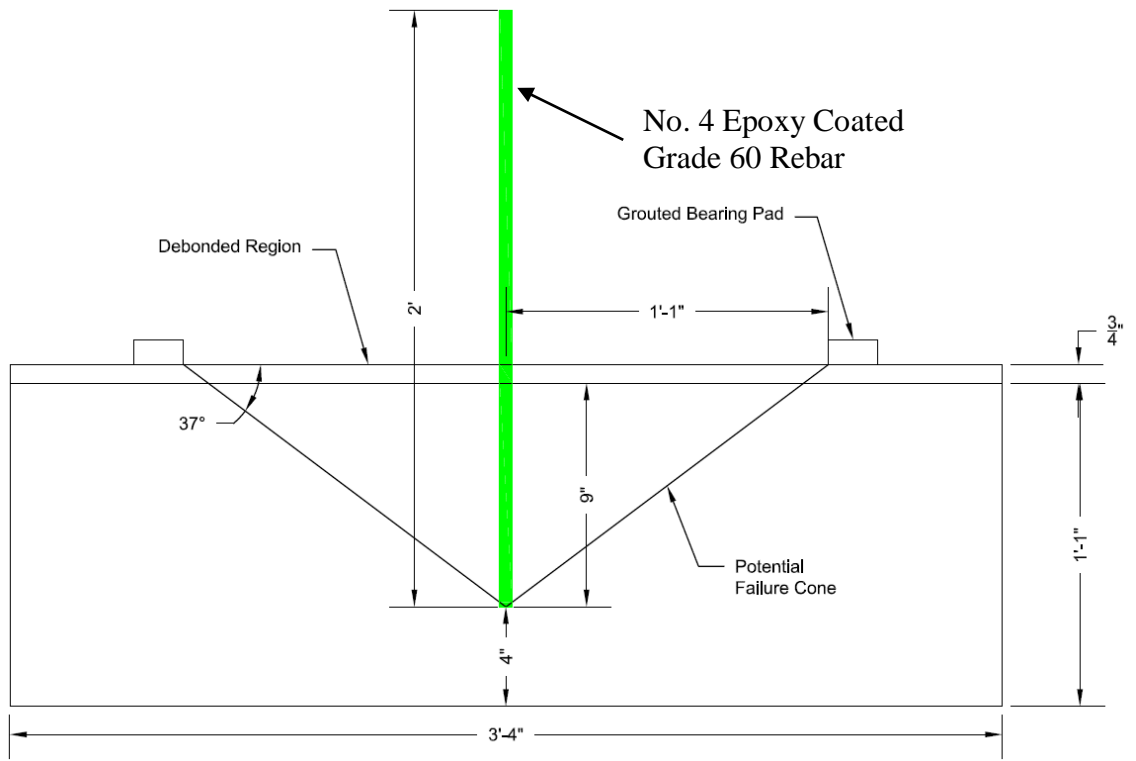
Side view of typical MN-shaped subassembly specimen including grouted bearing pads and potential failure cone.
